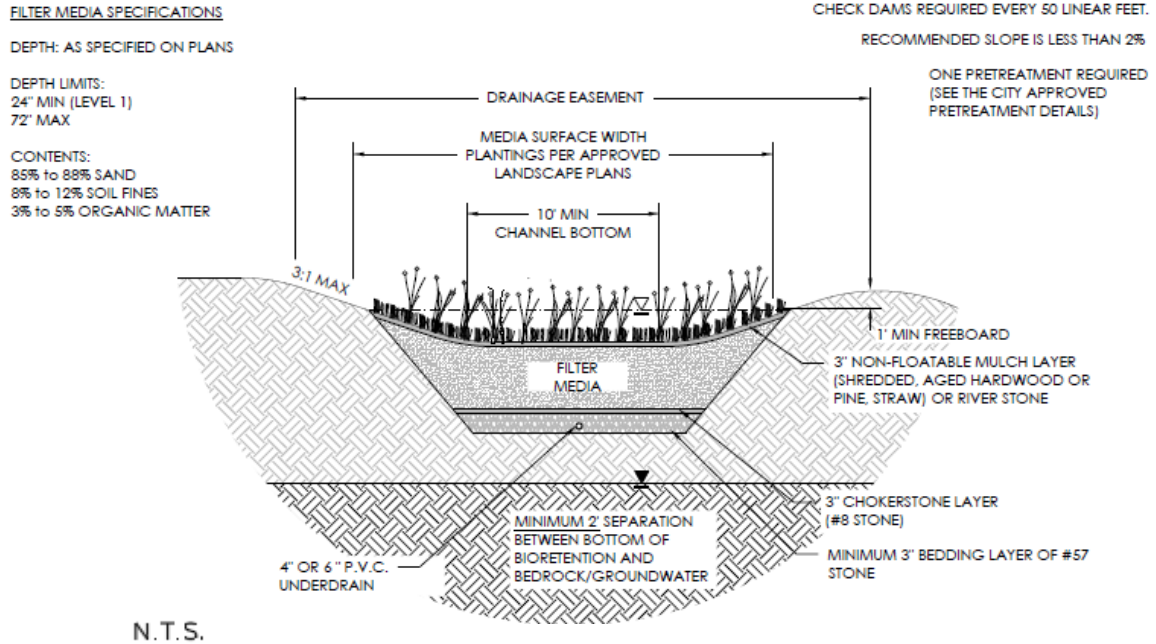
Typical Detail for Level 1 Water Quality Swale
